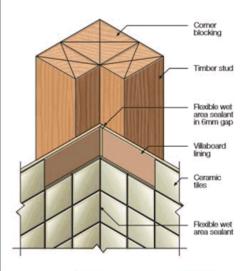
INTERNAL TILED CORNER - NON SHOWER AREA
